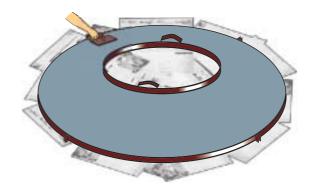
Fill the space between the two moulds with a mixture of 1:2 cement mortar and make it 2.5 centimetres thick and spread it uniformly.
